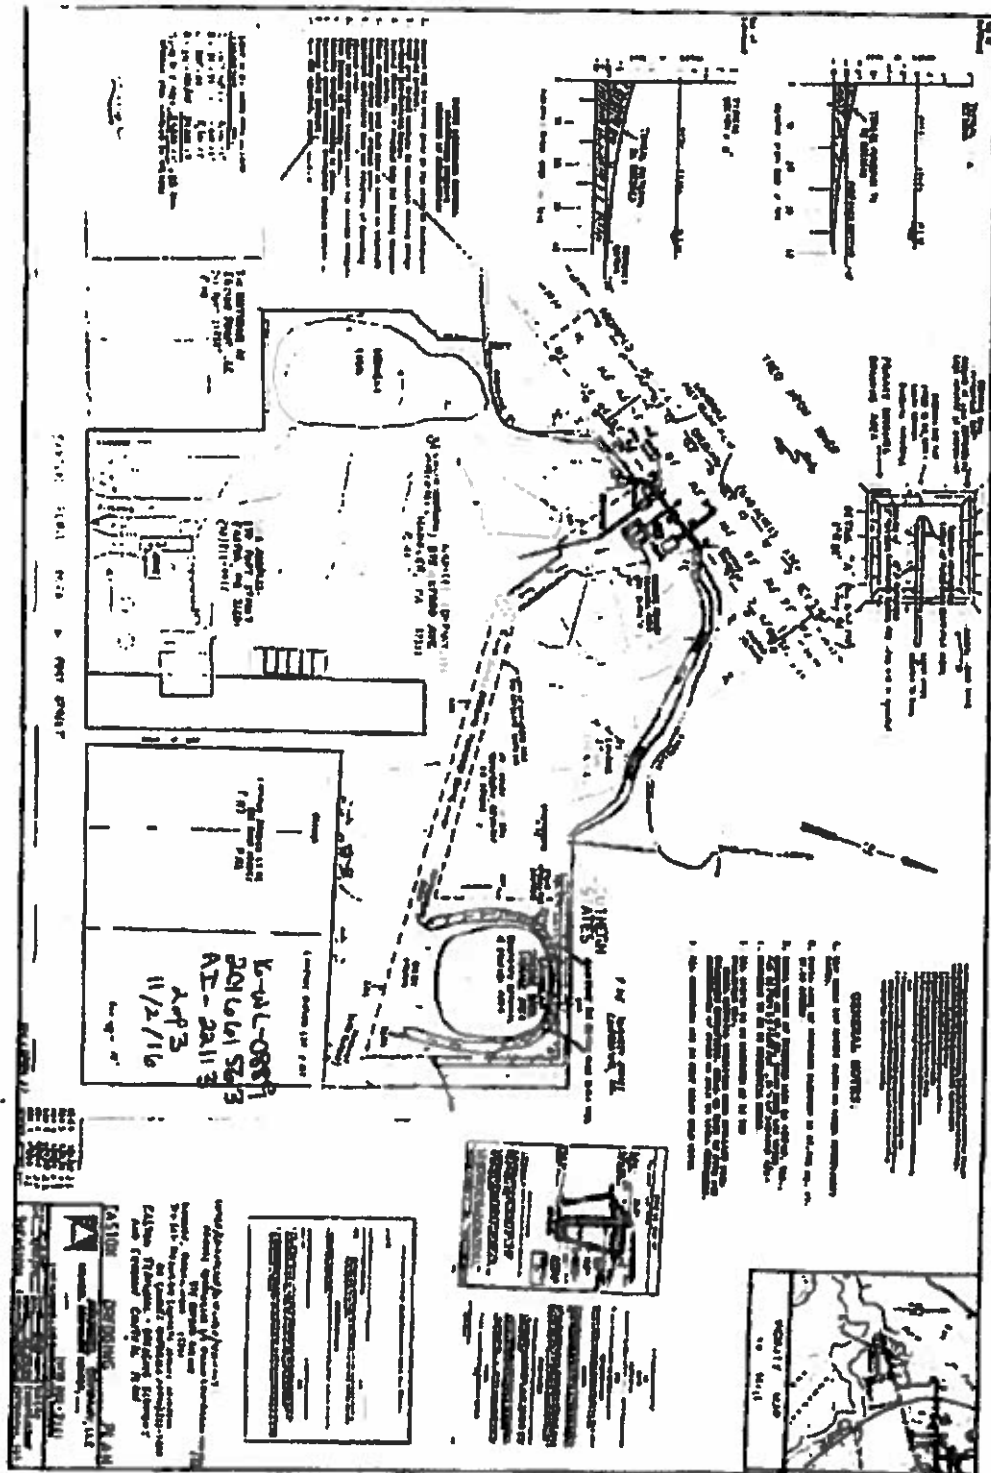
Unreadable engineering design provided to the public when asked for details about the permit application.
